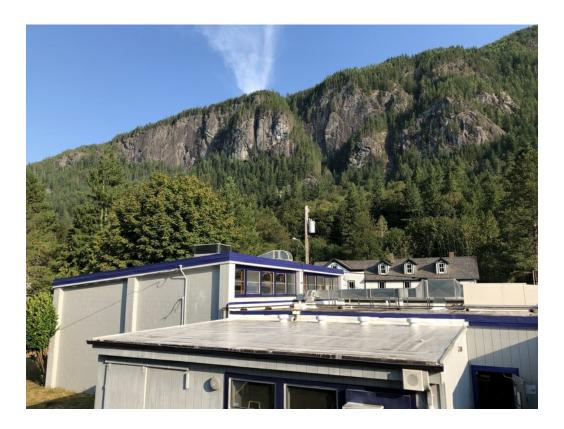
High Multipurpose Roof with High Band of Windows and Lower Admin Roof (Looking North)
